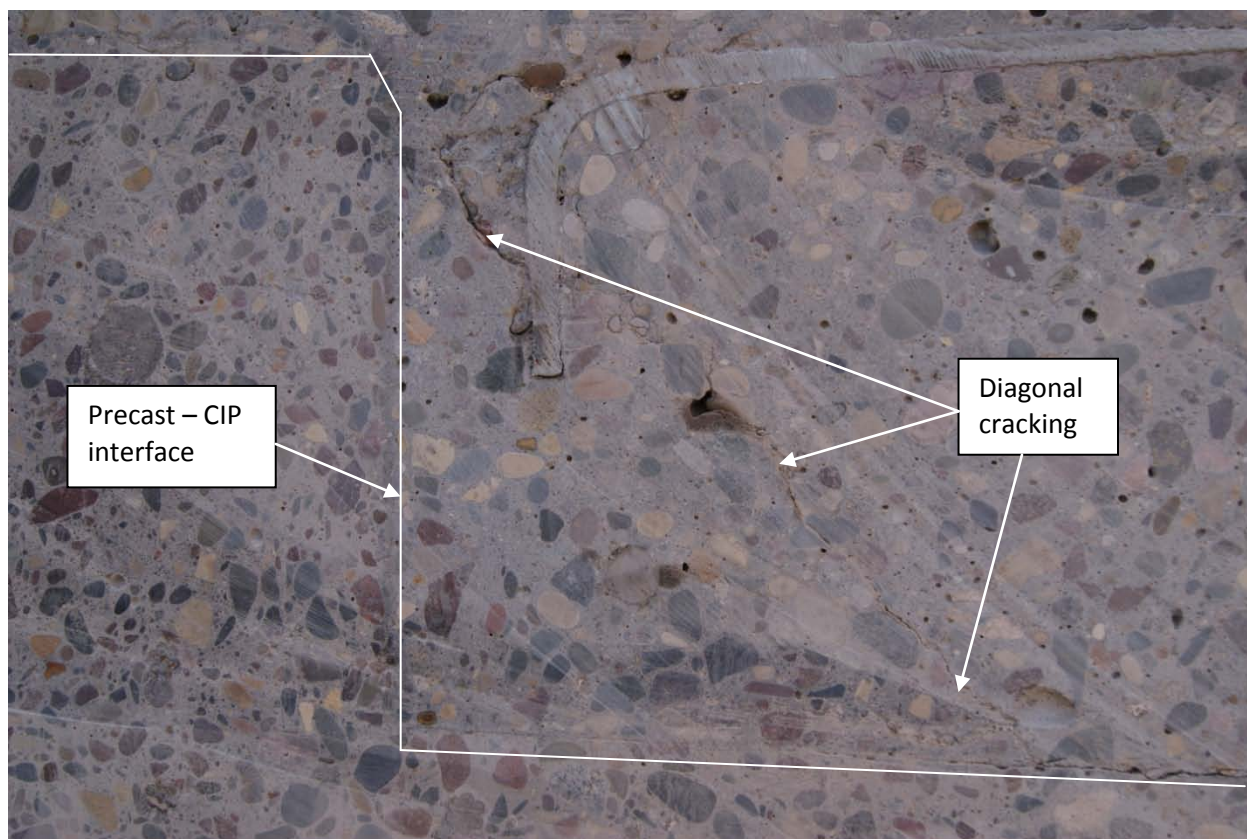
Close up view of diagonal crack identified on east face of panel 2 in the Concept 2 laboratory bridge
